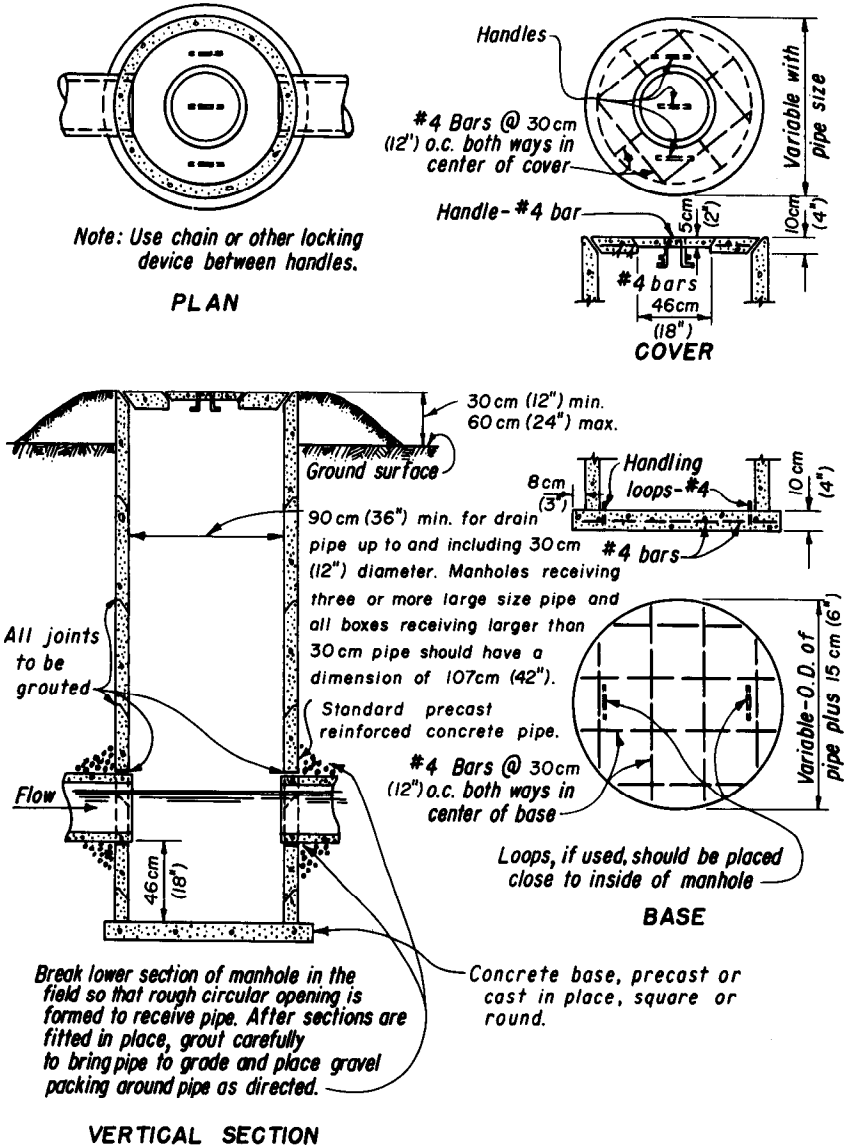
Typical manhole design for a closed drain. Drawing 103-D-686.
